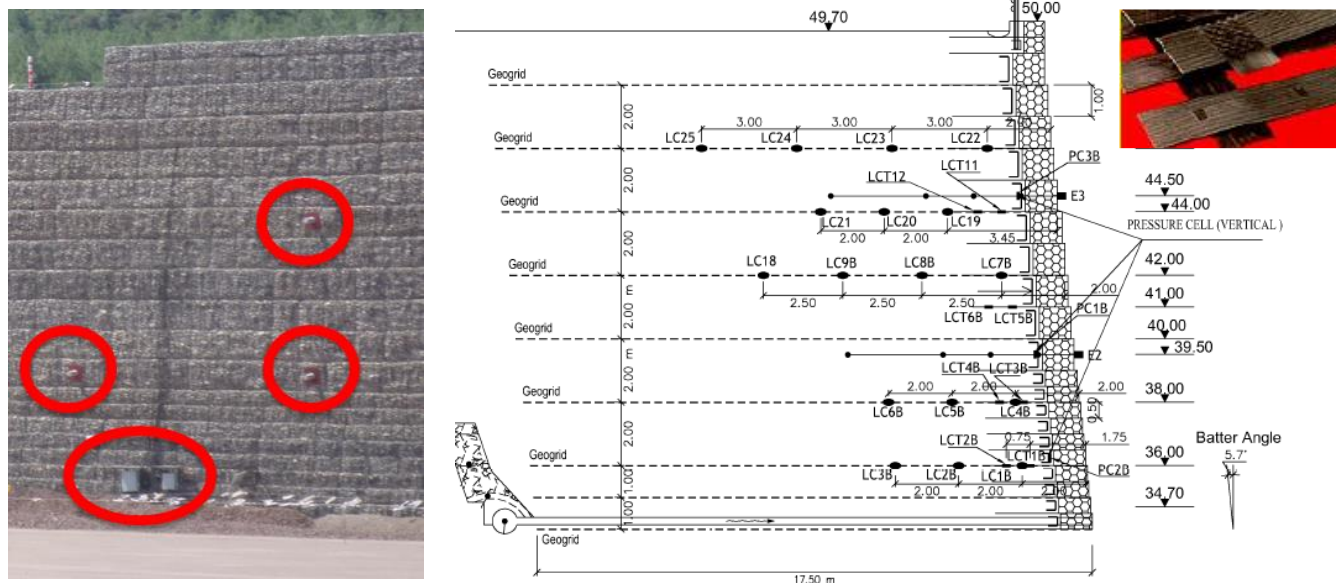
The instrumented sections and the instrumentation layout of the Izmir wall section with primary reinforcement spacing of 2 m; at top right the coated polyester geogrids
